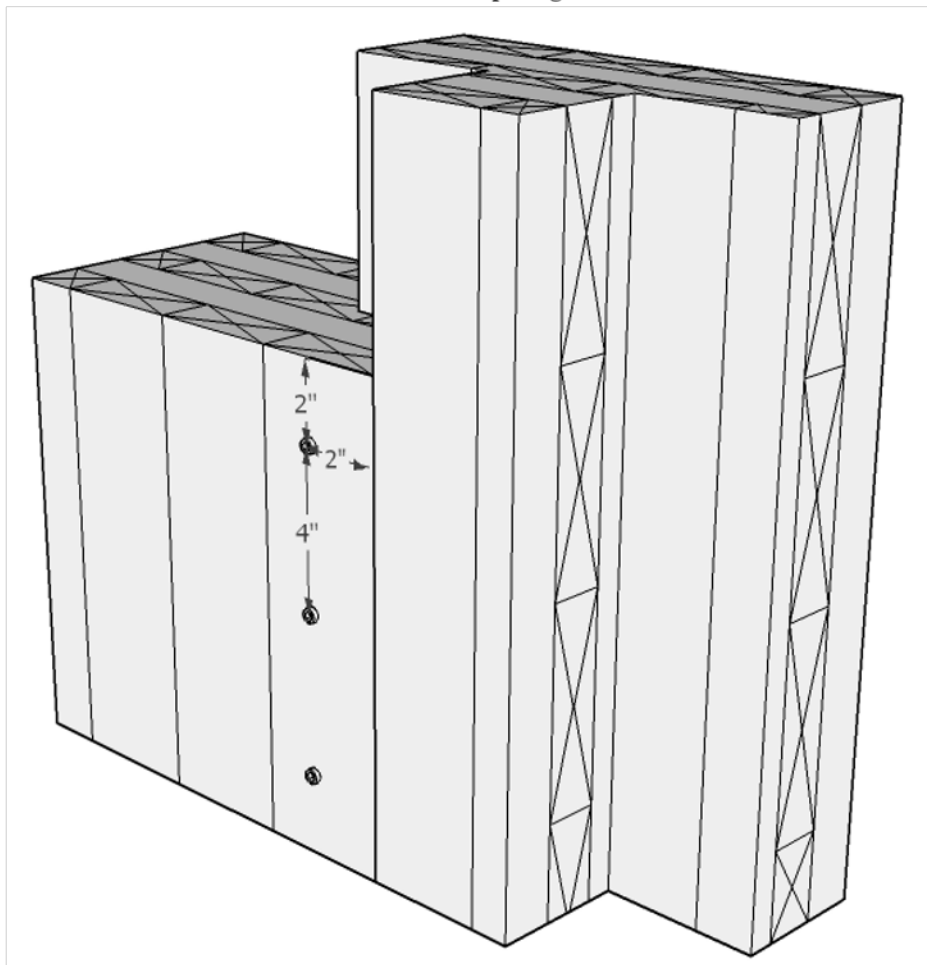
Half-Lap Assembly and Fastener Spacing
